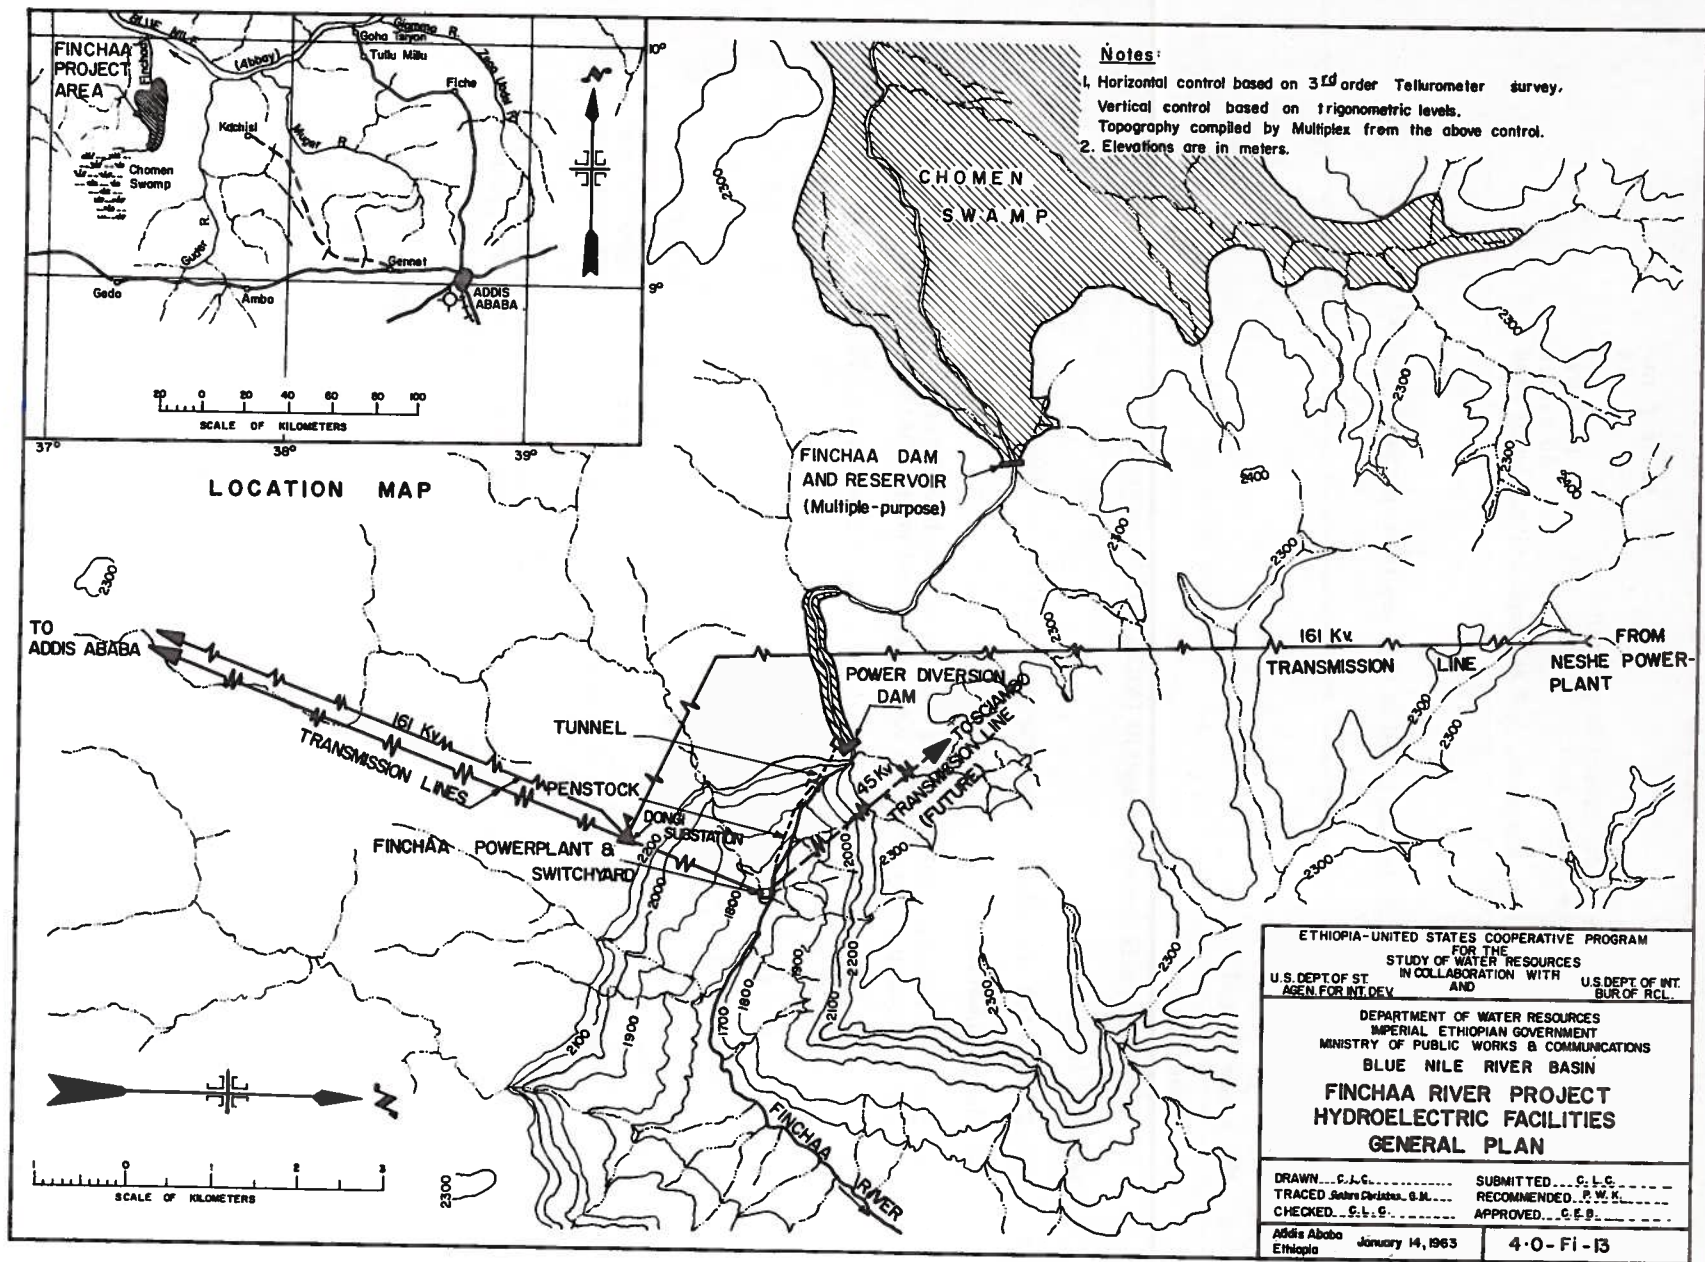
Finchaa Project--General Plan, Hydroelectric Facilities
